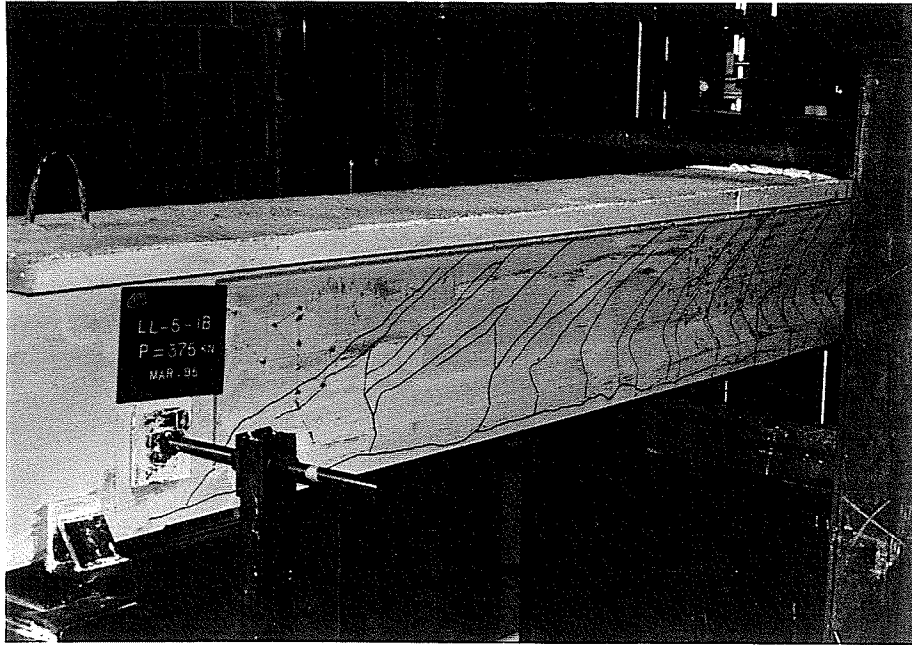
Diagonal cracks covering the entire span of beams prestressed by Leadline bars
